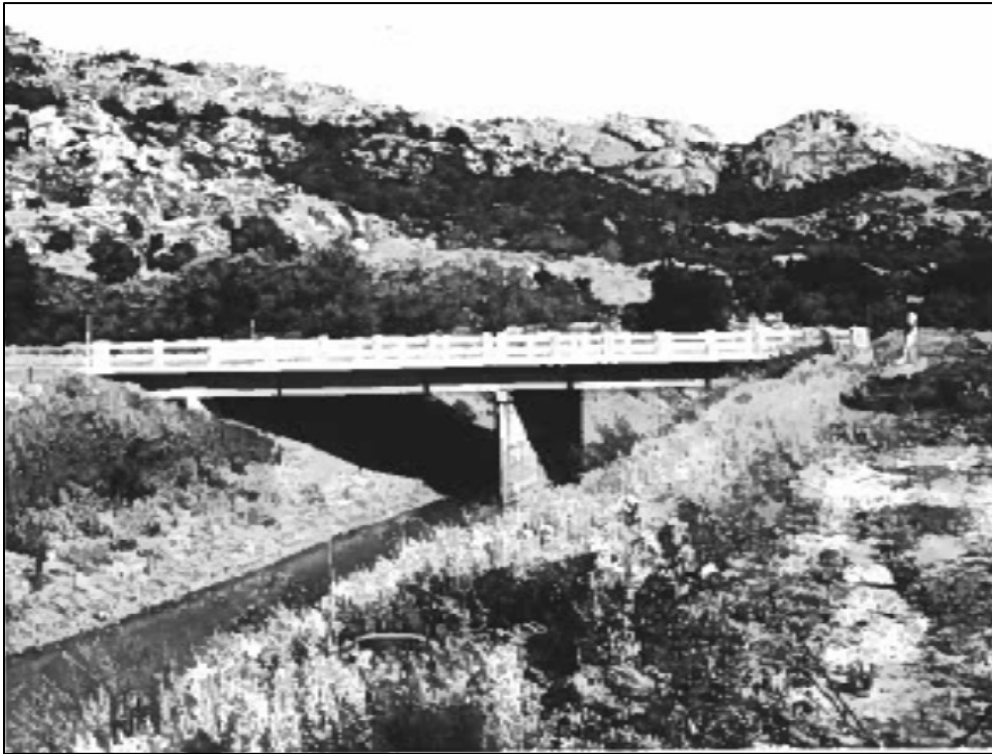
Highway Bridge #44 over the main canal on the W.C. Austin Project (Oklahoma) built in 1941. Common elements on nearly every Reclamation project are road or highway bridges.³²⁷
